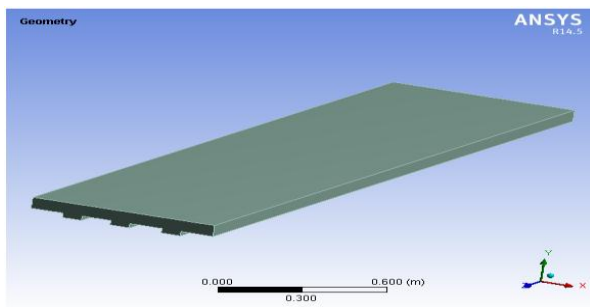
(A) Geometry of Bridge span with three stiffeners
